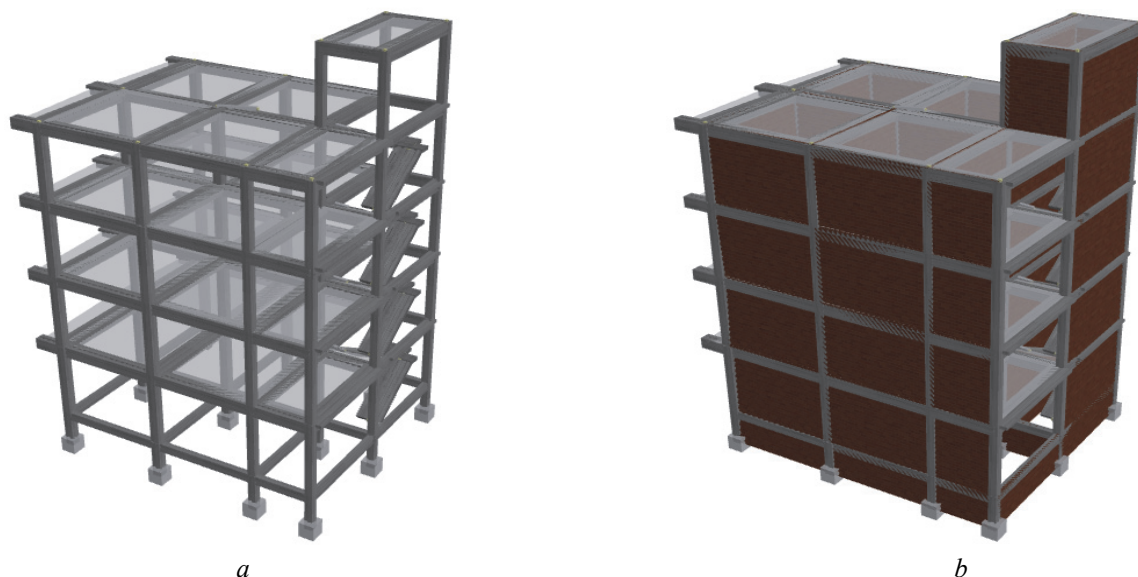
Bare framed buildings BFSB, BFCB, BFHB, BF (a) and masonry infilled building INSB, INCB, INHB (b)
